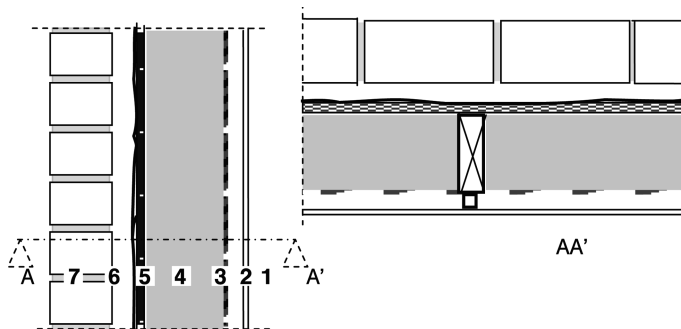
Timber-framed outer wall, reference assembly (1: inside lining, 2: service cavity, 3: air and vapour retarder, 4: thermal insulation, 5: sheathing, 6: building paper, 7: outside finish).
